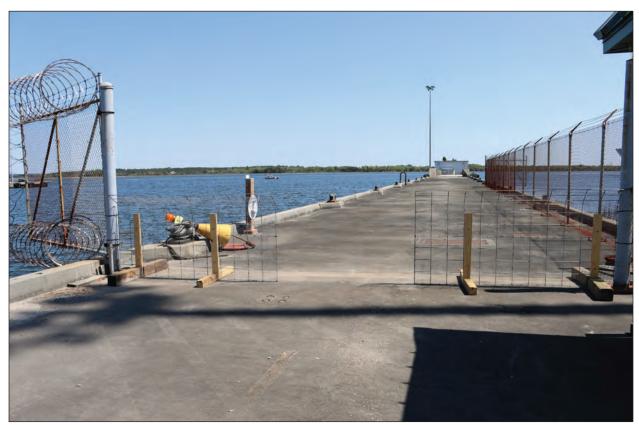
SHPO Site No. 8422, Pier Romeo, facing northeast from Sentry house.
